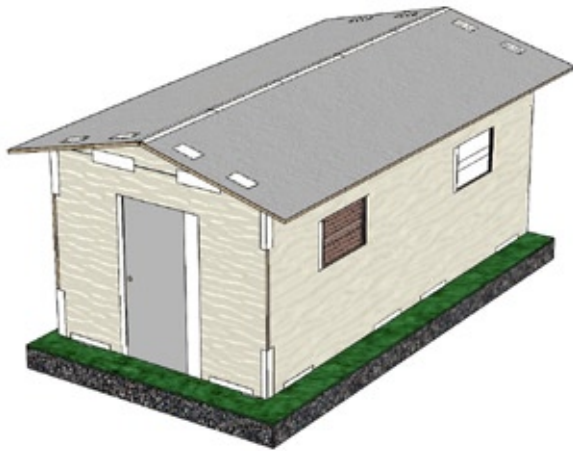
Side walls are set in place; end walls are prepared by attaching panel connectors and gables.
